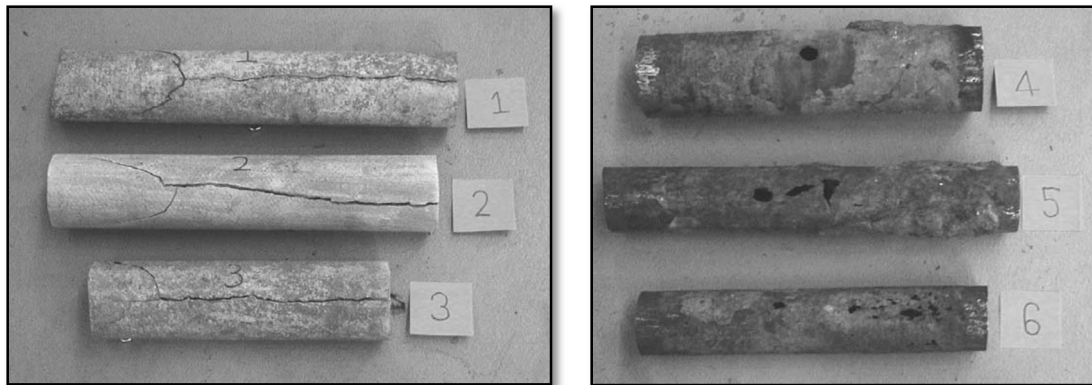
Asbestos Cement and Steel pipe failures from the field (Greyvenstein & Van Zyl, 2007)
